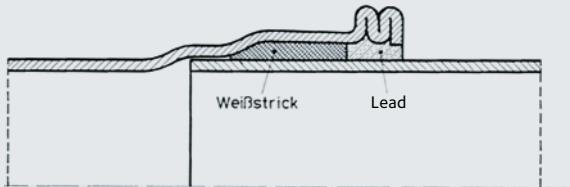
Long-seam welded pipe with caulked lead joint and double flare as reinforcement
